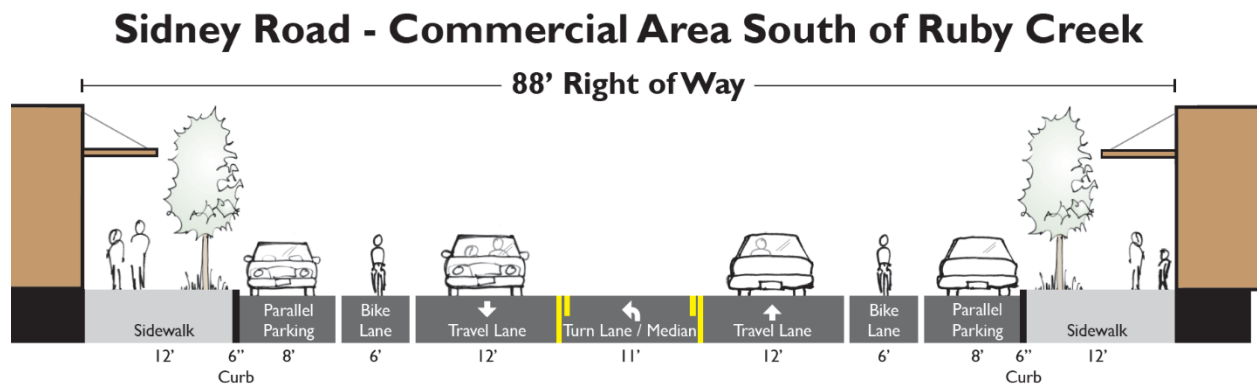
Sidney Road SW – Storefront Road Section. This road section corresponds with the section of Sidney Road SW designated as a storefront street in Figure 13.
